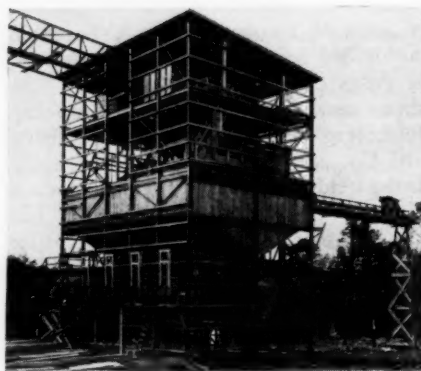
Breaker, Gunton Coal Co., Bernice Pa., under construction
